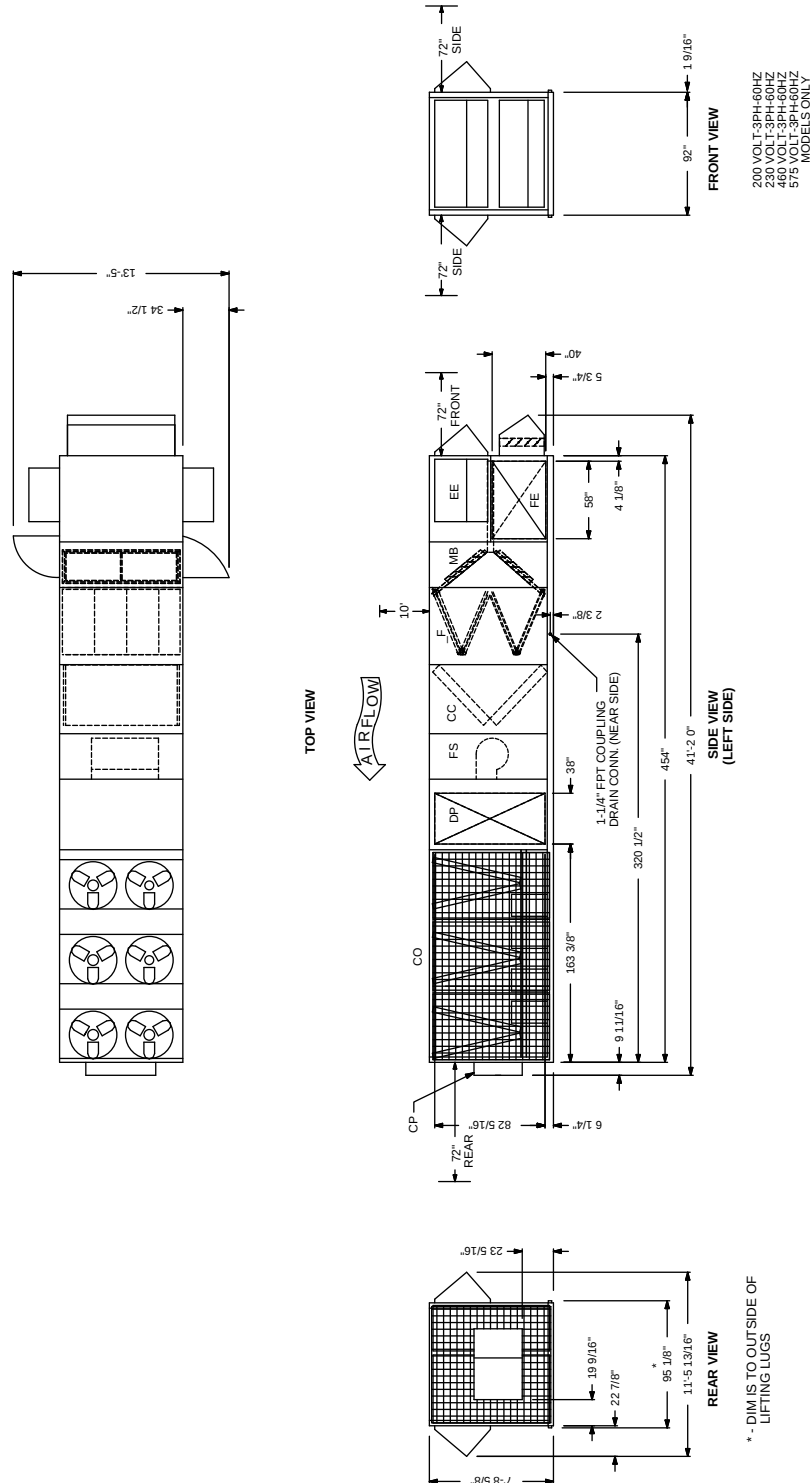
GENERAL ARRANGEMENT DRAWING
